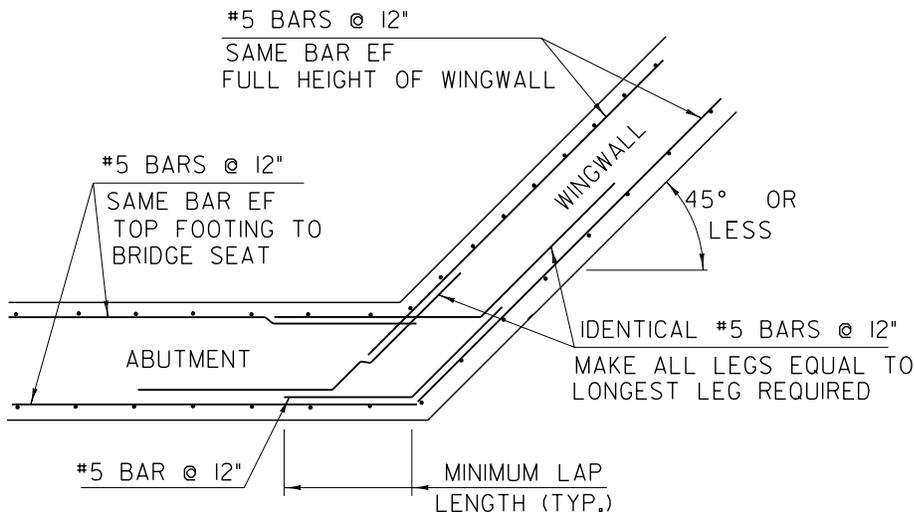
1 Wing wall corner detail for 45° or under
